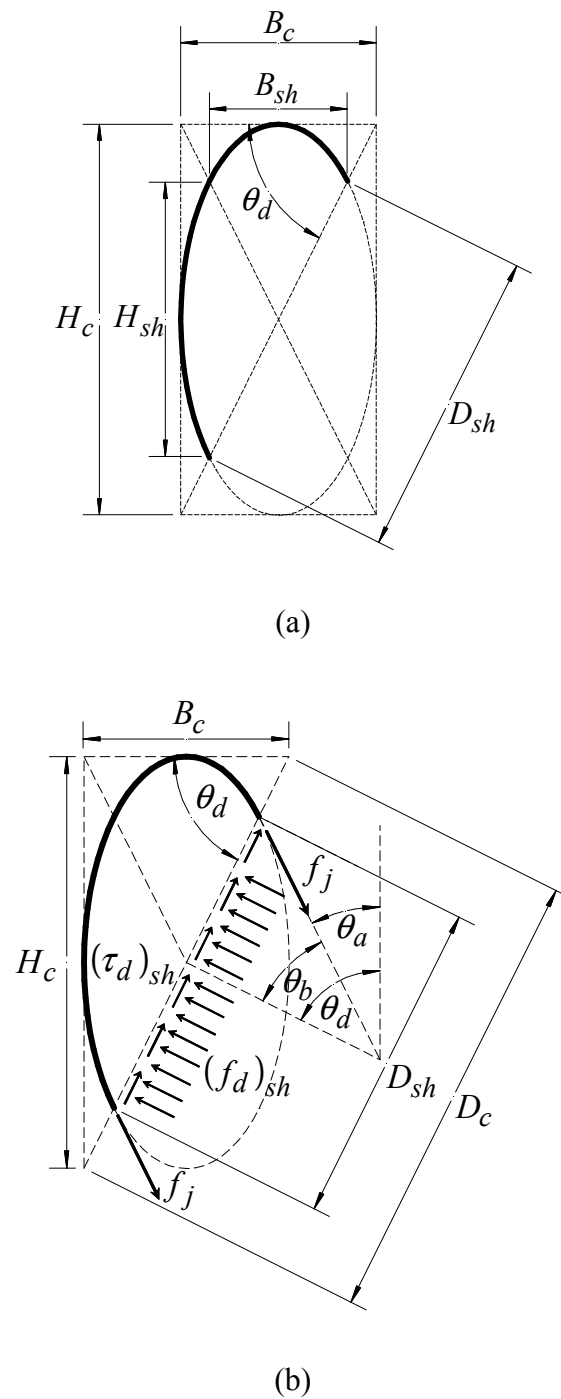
Elliptical FRP-confined concrete section: (a) typical section geometry, (b) diagonal equilibrium
